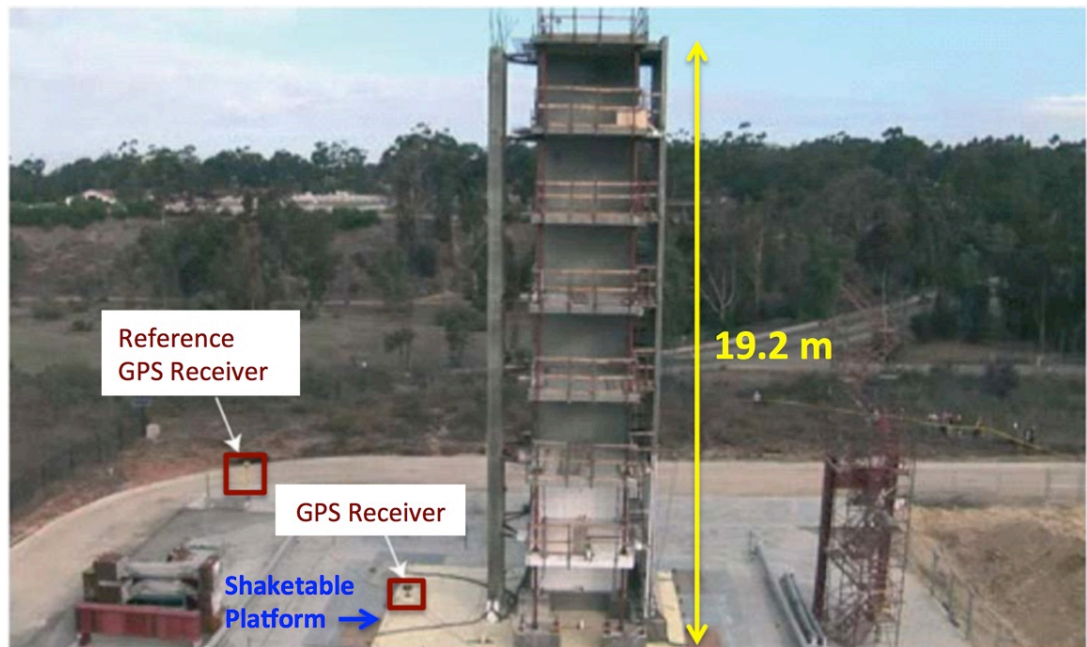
NEES/UCSD LHPOST experiment with a seven-floor high concrete building on the steel platform (photograph from Bock et al. (2011))
